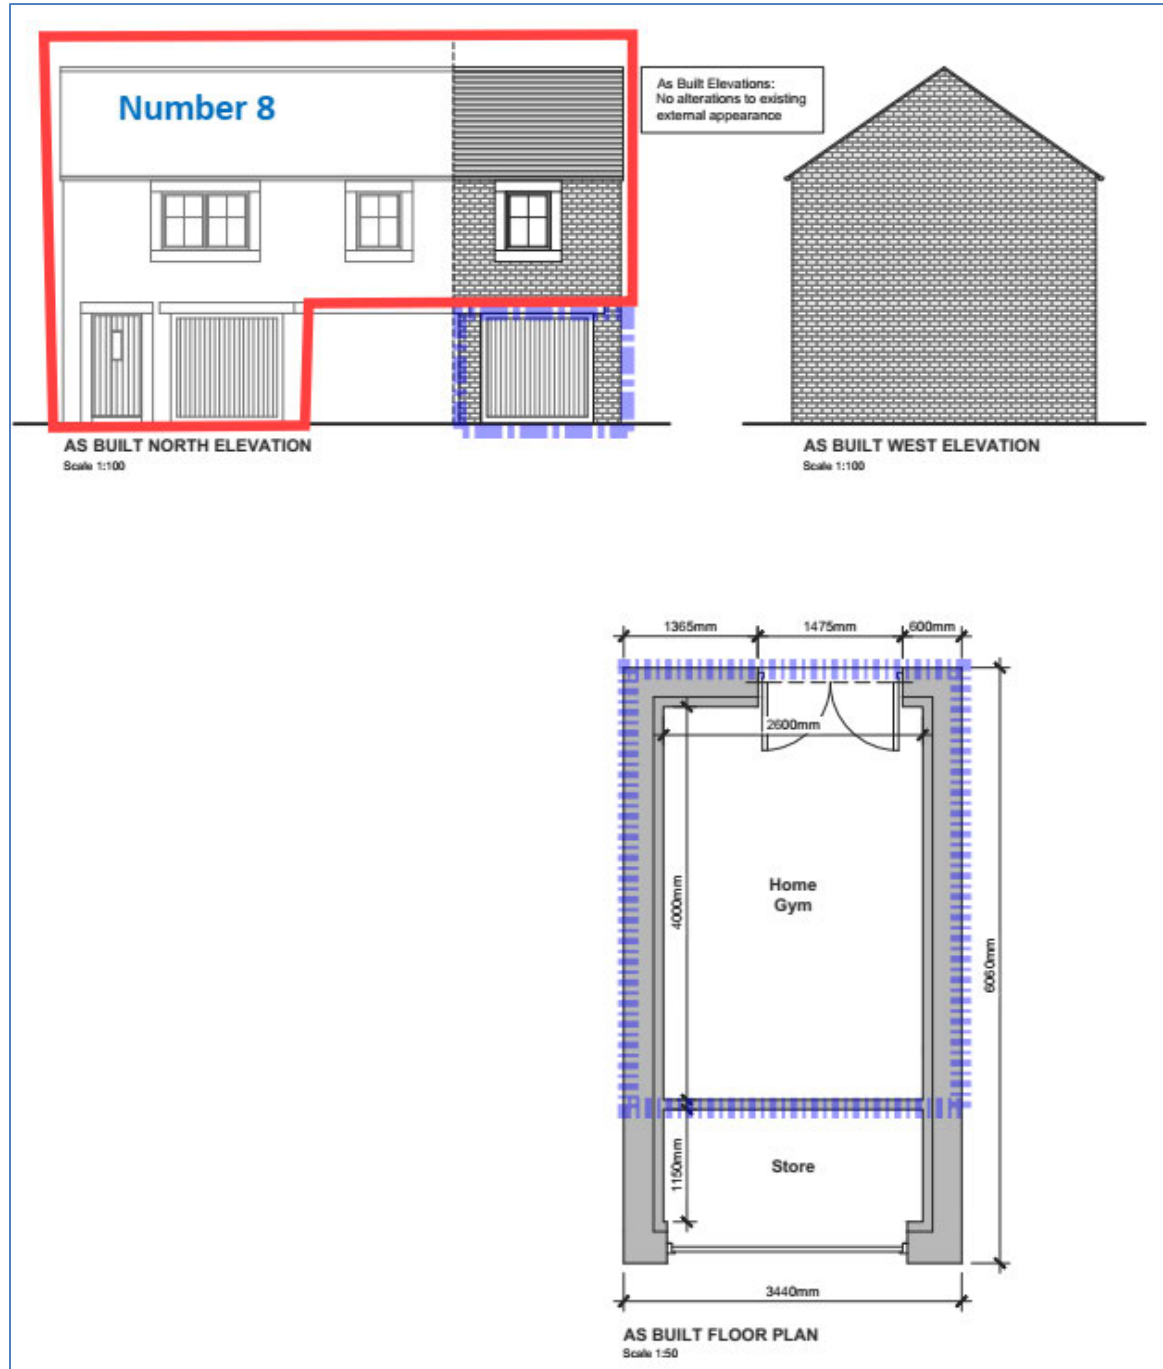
Floor Plan & Elevations from Plan. Ap. Documents]
